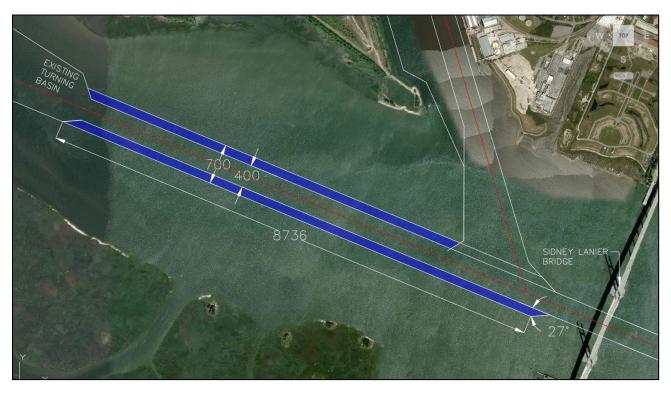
Sidney Lanier Bridge Meeting Area Dimensions
